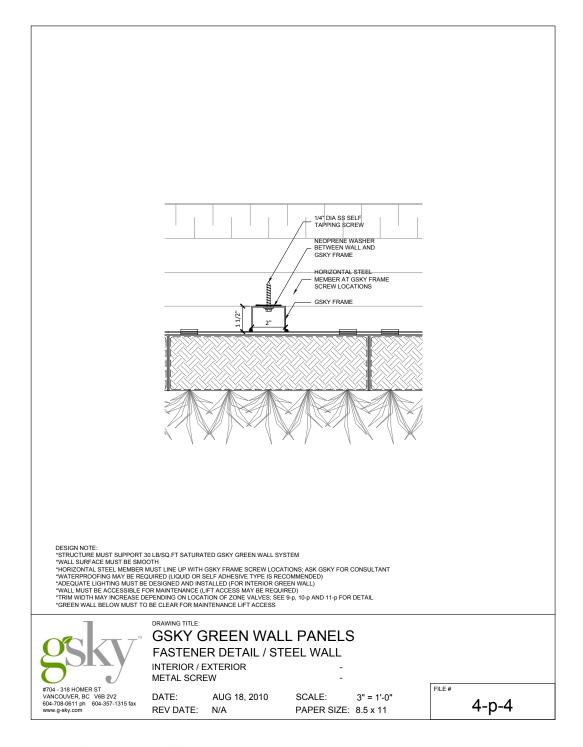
FASTENER DETAIL/STEEL WALL http://gsky.com/green-walls/pro/cad-spec/
